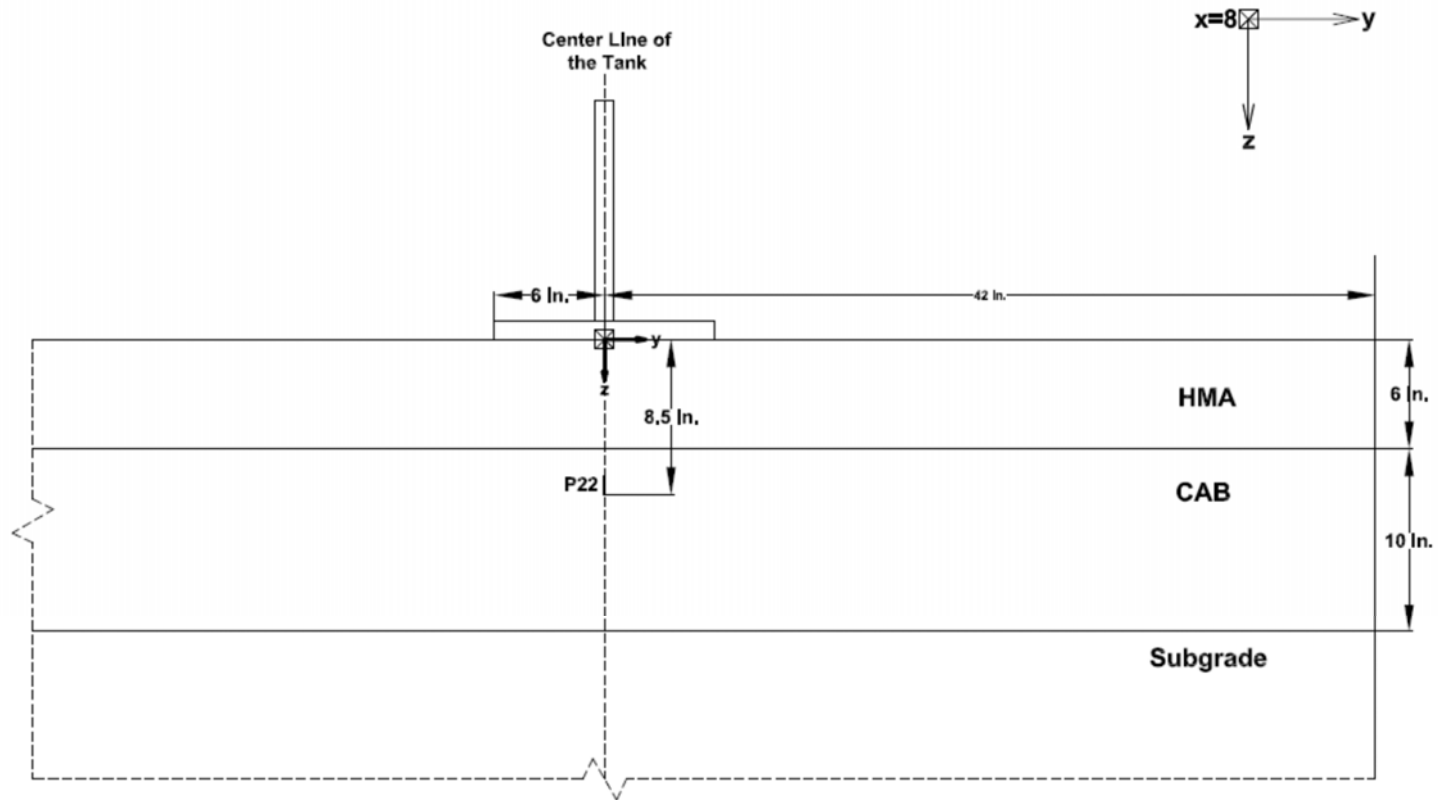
Instrumentation plan for experiment No. 2—Profile view, X = 8 inches
